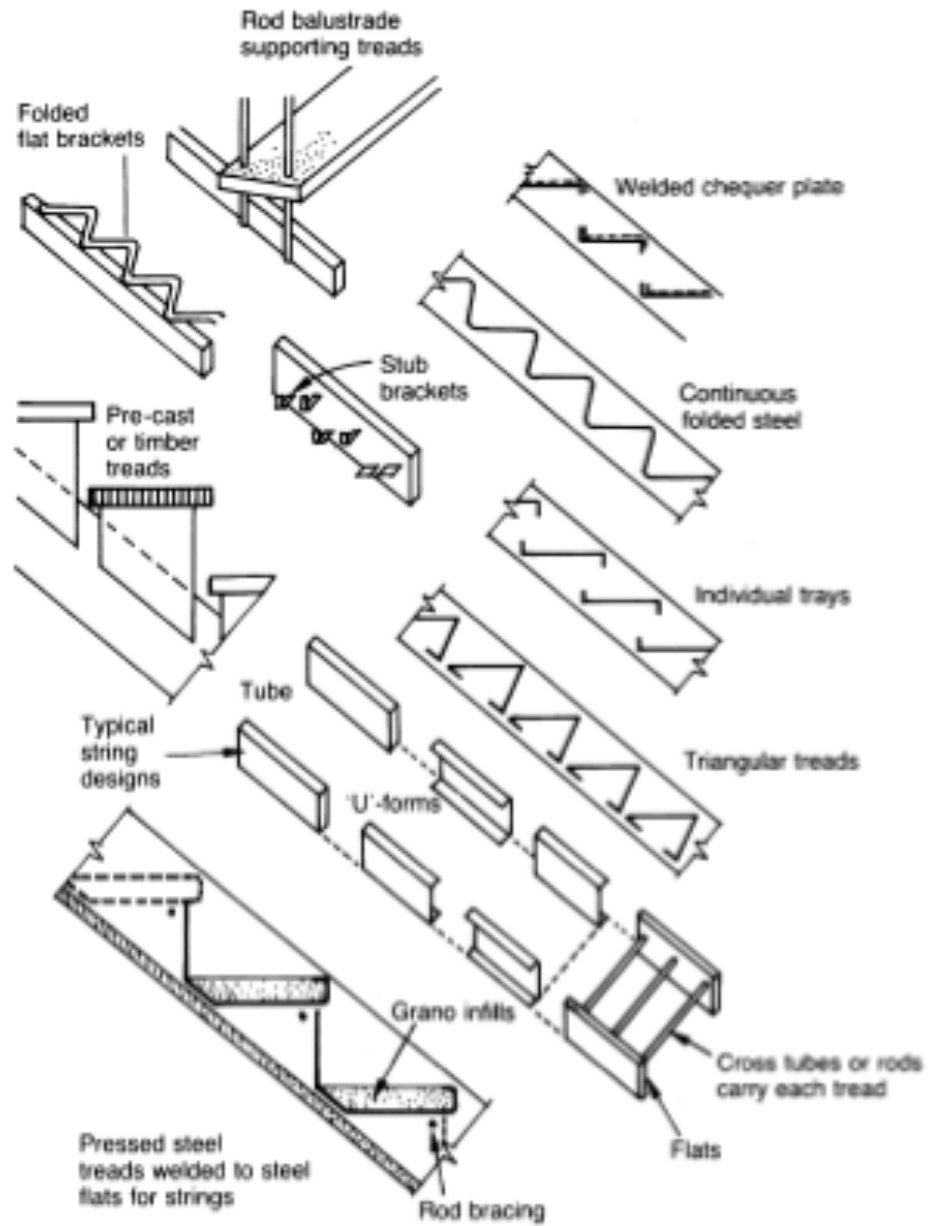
Folded steel stairs: Profiles for folded sheet stairs or treads
